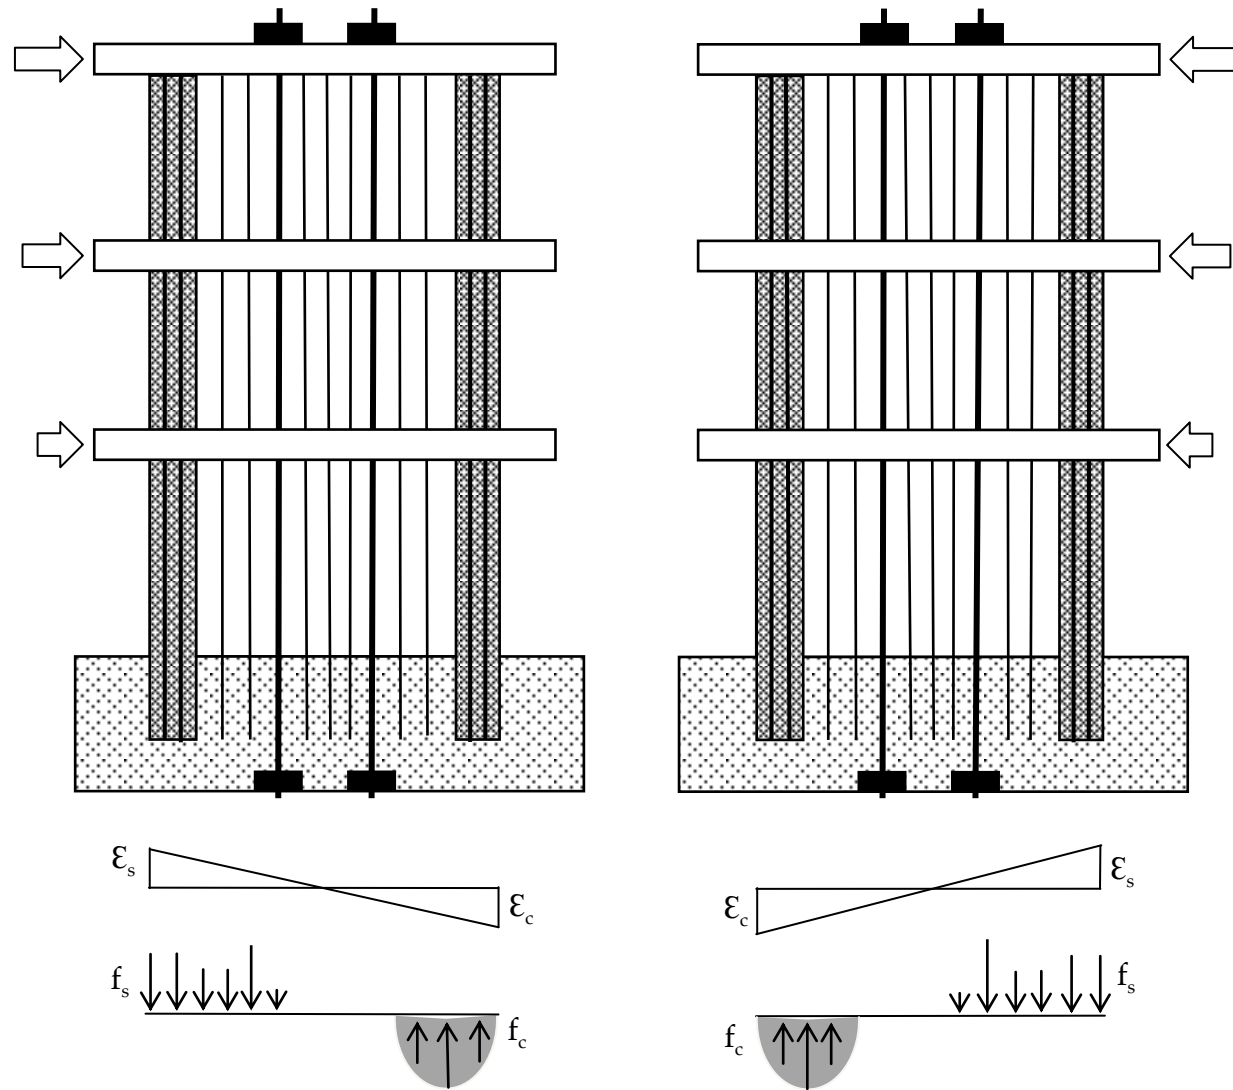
Base cyclic stresses in Unbonded PT CIP concrete special structural wall due to lateral loads
